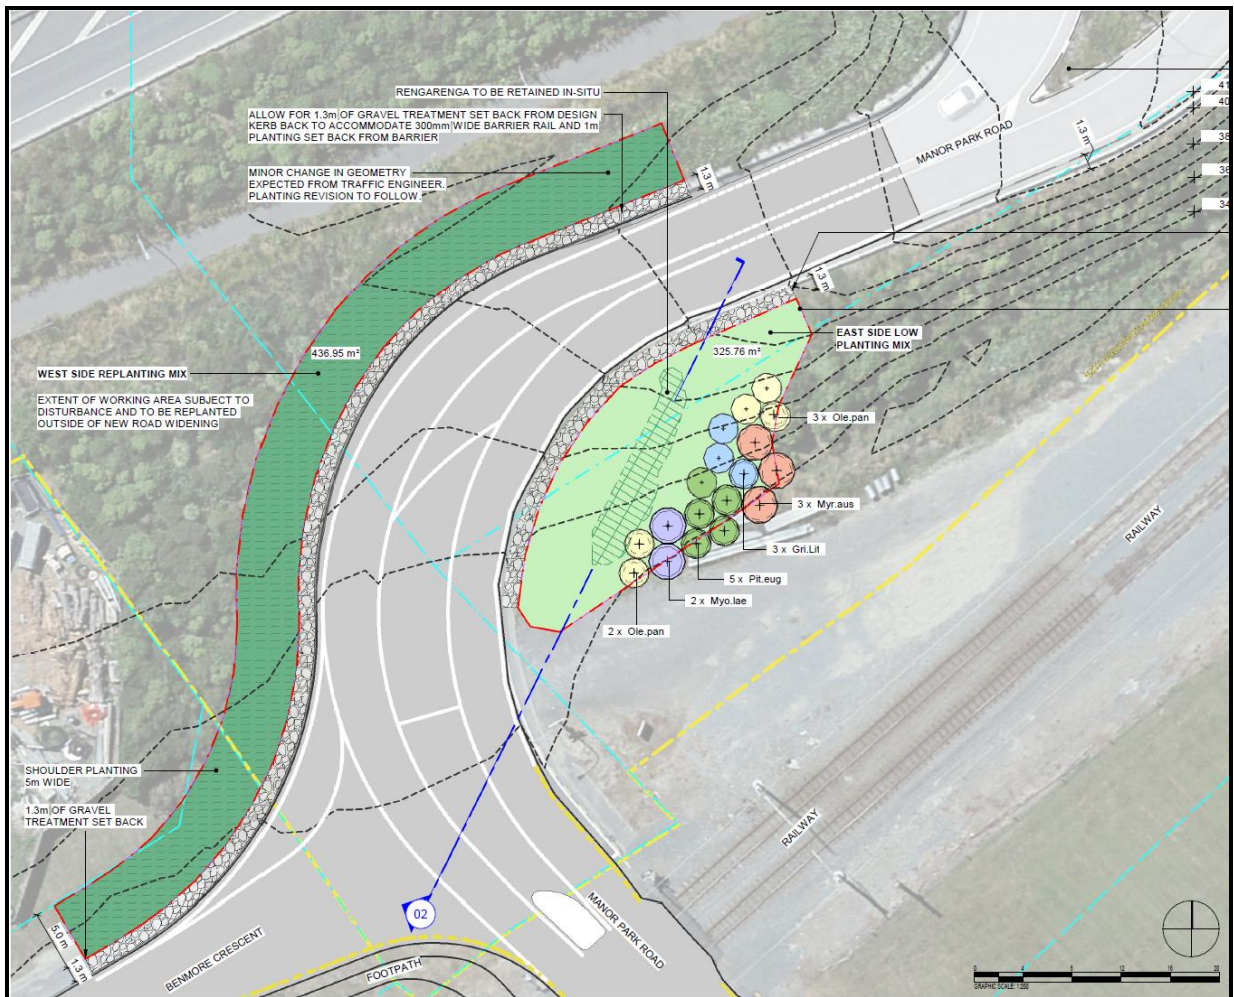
Replanting of Benmore Crescent / Manor Park Road intersection
